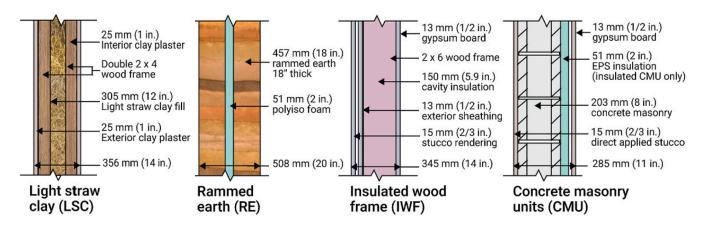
Section drawings of the assessed wall systems, L. Ben-Alon, 2021
